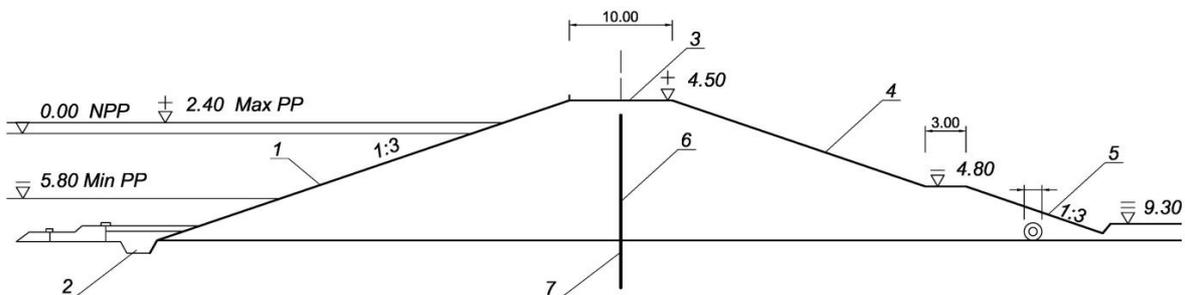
Cross-section of the Chańcza dam; 1 = curtain made of 20 cm thick reinforced concrete slabs, laid on 10 cm thick stabilized layer, 2 = clay blanket, 50 cm thick, covered with Estrofol foil and protective layer, 3 = road along the crest, 10 m wide, 4 = vegetative cover (grass), 5 = pipe drainage system / 1.0 m in filtration gravel pack, 6 = seepage control barrier, 7 = grouted curtain; Max PP = maximum pool level, Min PP = minimum pool level, NPP = normal water level; source: own study based on materials from the Regional Water Management Authority in Krakow
